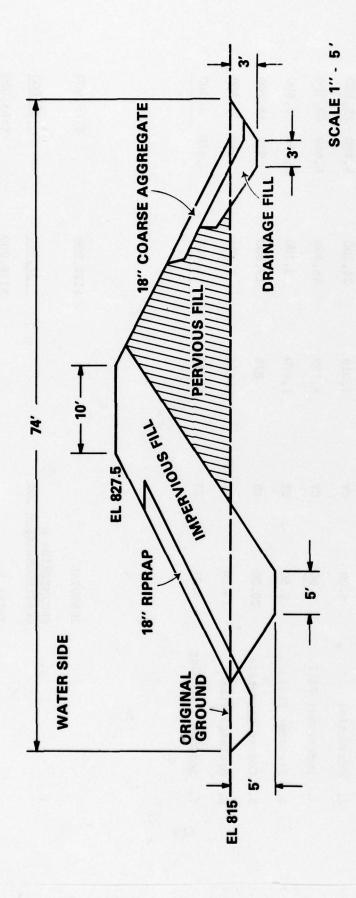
TOWN OF OWEGO STP NO. 2 EARTH LEVEE CROSS SECTION
